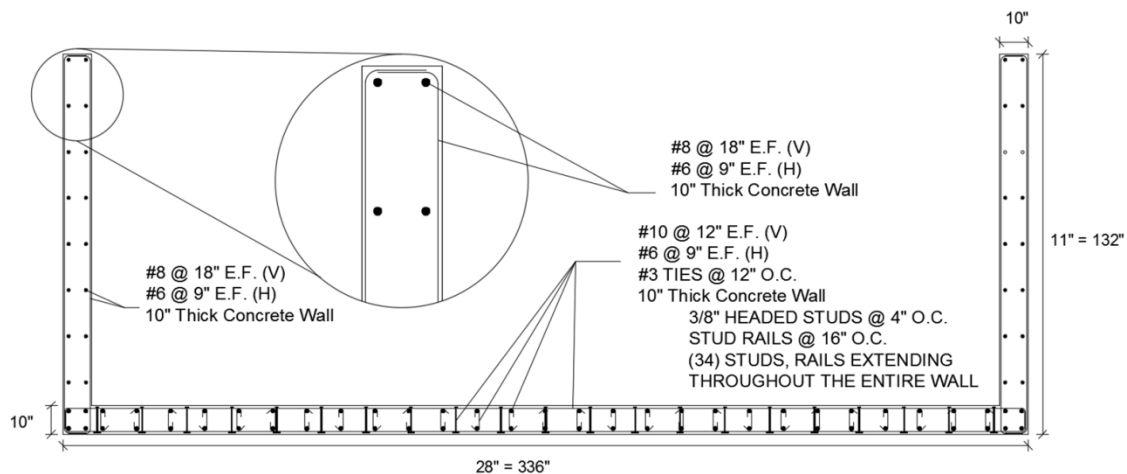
New Elevator/ Mech. Room shear wall cross-section at the ground floor level
